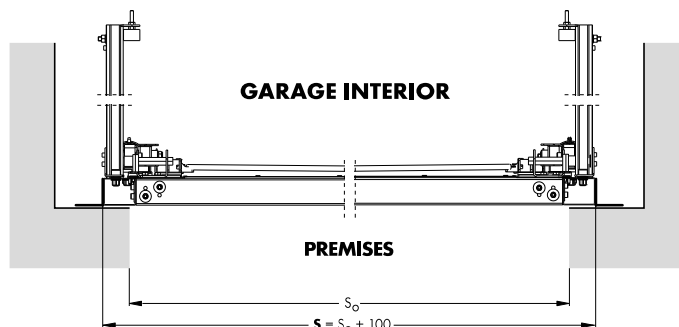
Installation behind the opening (horizontal section) of Komfort, Select, Connect
